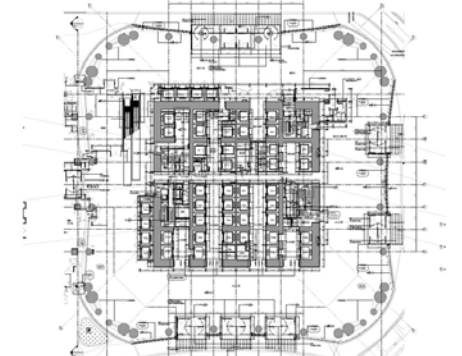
Typical layout plan of CTF Tianjin Tower (Source: Guangjing Sha)
